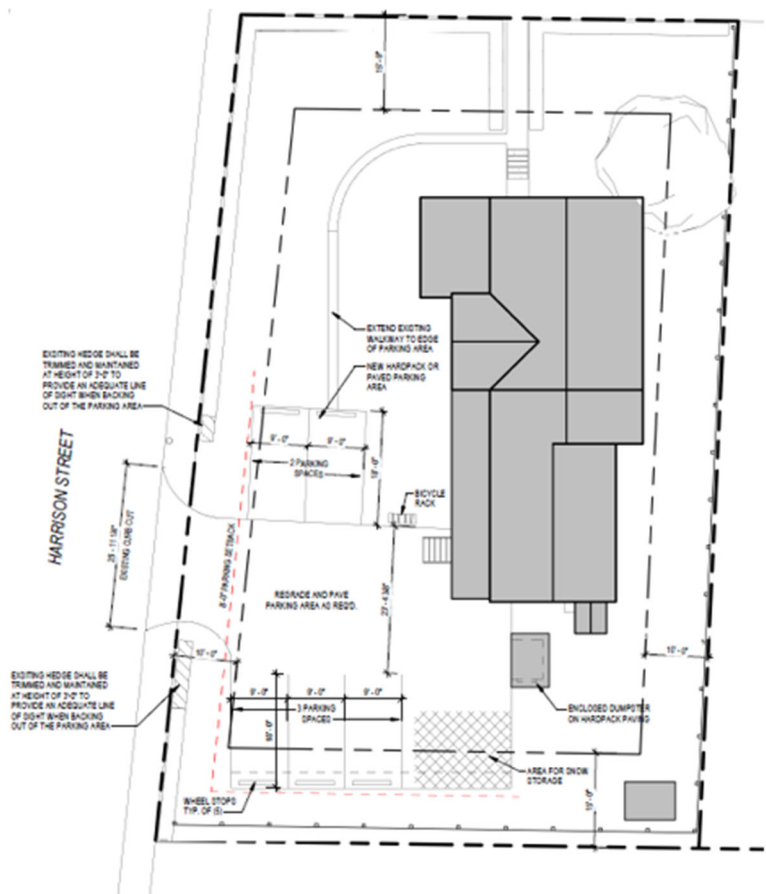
A snippet of the proposed conditions plan for 133 Roxbury St.
